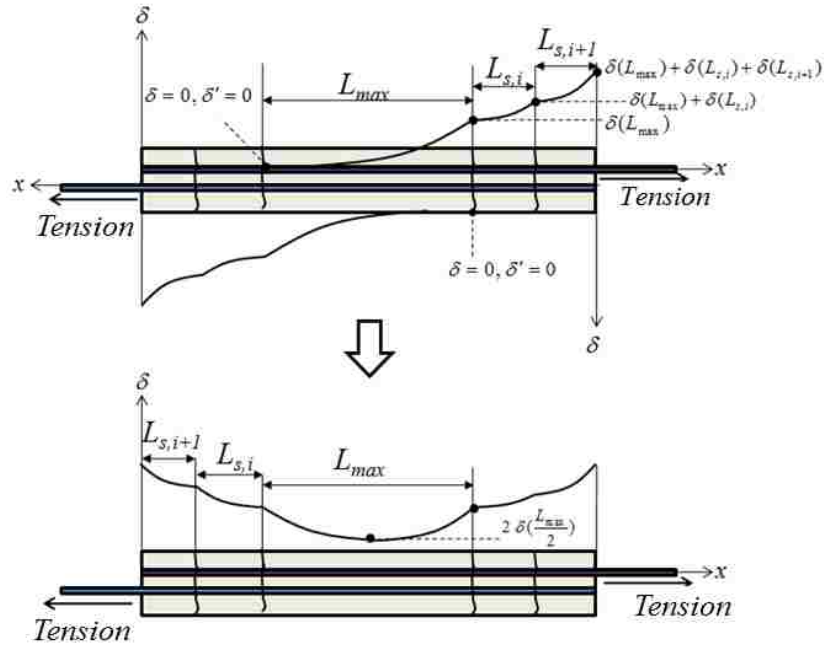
Slip Redistribution of Rebar with Cracked Concrete
